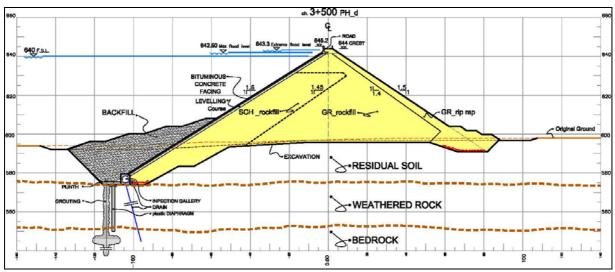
GERD project, saddle dam, TYPICAL CROSS SECTION ch. 3+500
